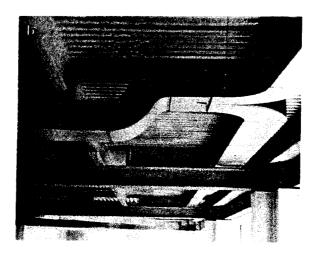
Stub-Girder Floor System After Installation of Ductwork
